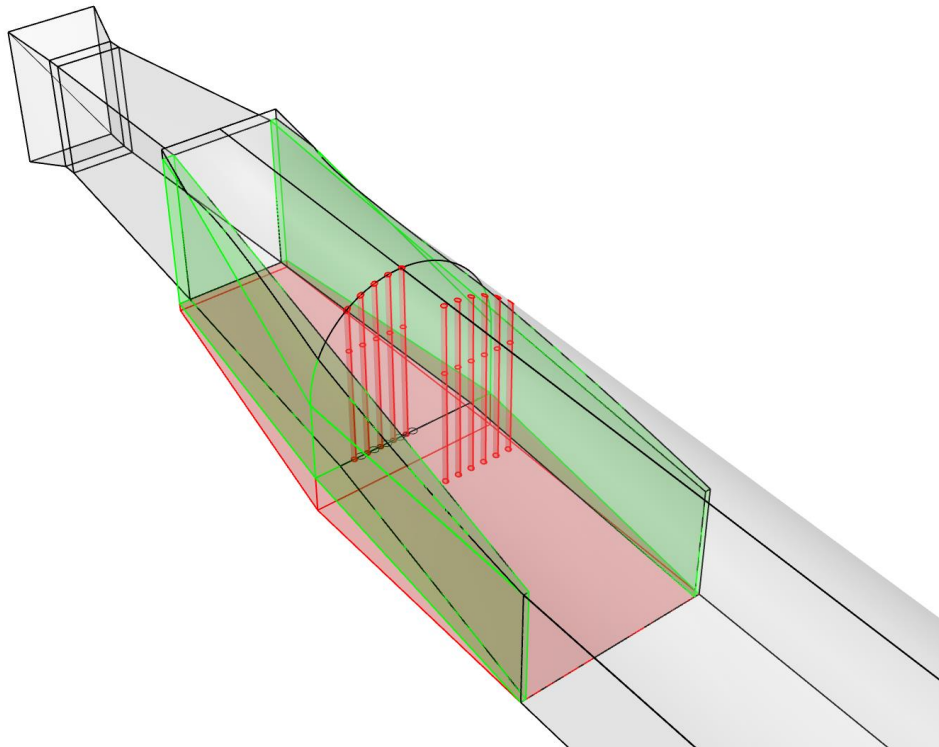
Ramp 01 & side walls & flow calming pillars with D_i 0.3m, distance 0.5 m, passable positioning
